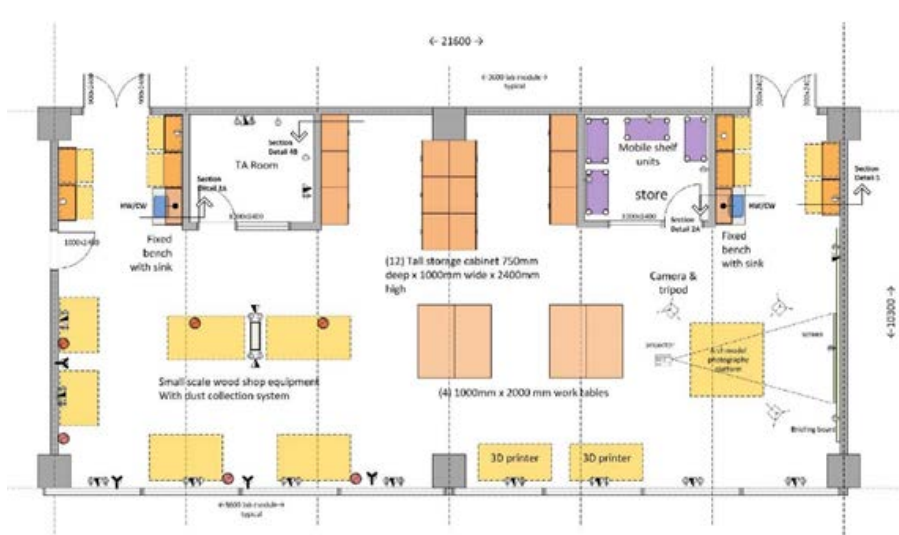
Layout plan of model-making workshop (B366) (not to scale)
